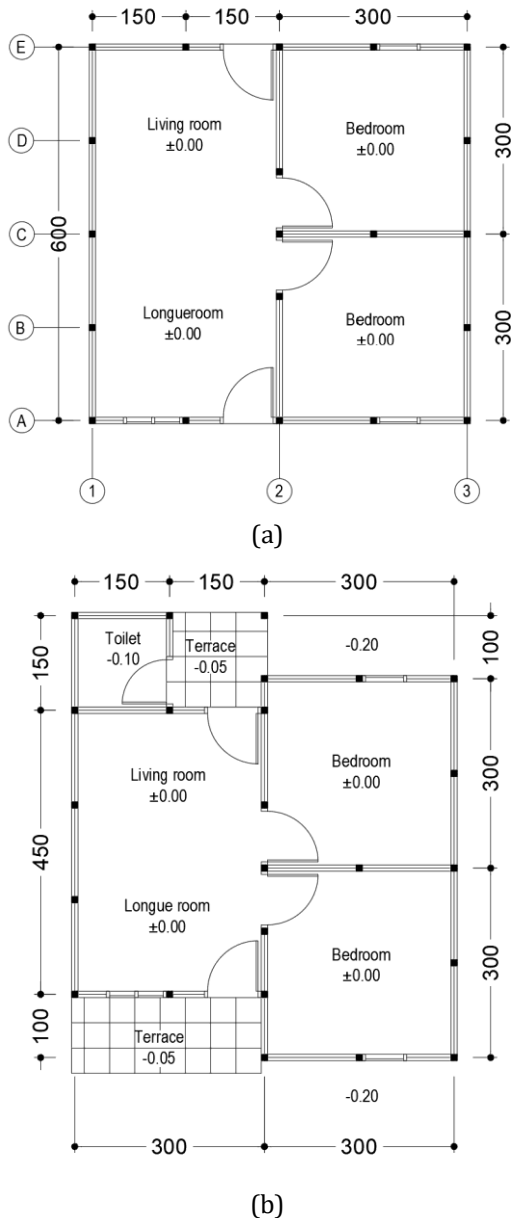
Simple House Floor Plan (a) Typical Floor Plan (b) Variation Floor Plan .
